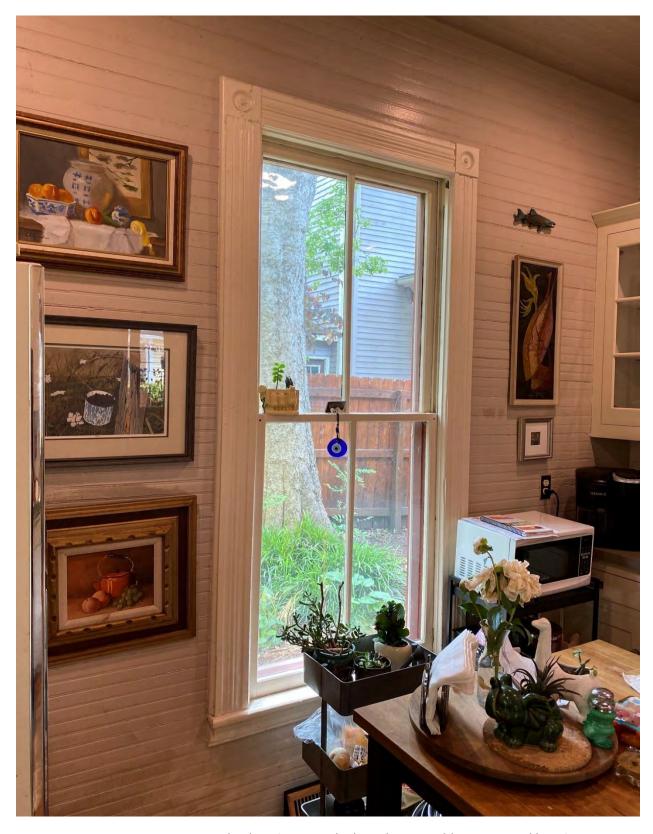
924 Carr St. side elevation reworked window, possibly not original location
